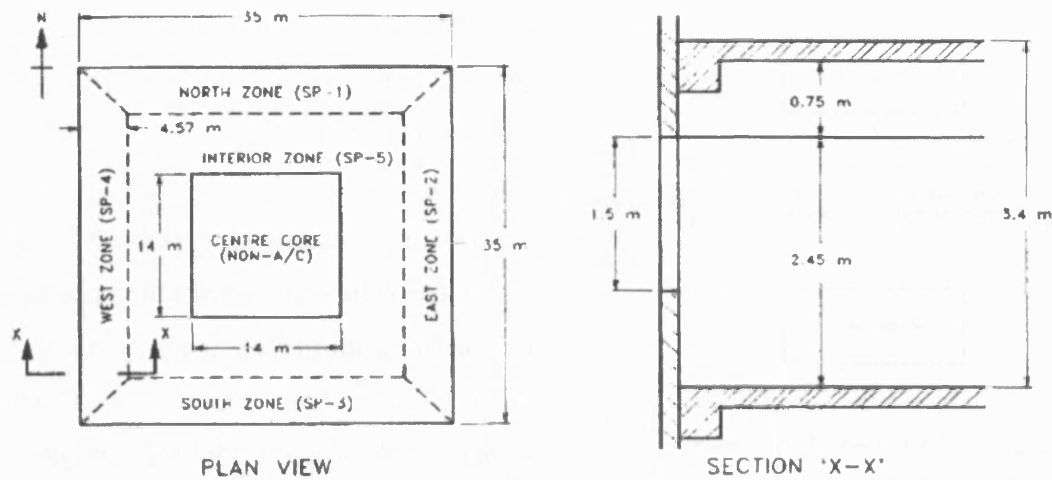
Plan and section of a typical floor of the base case building [3]
